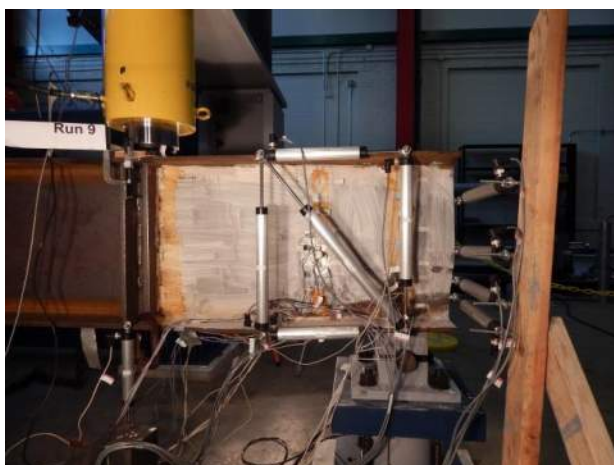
Undamaged Girder Left: +0.25 in
